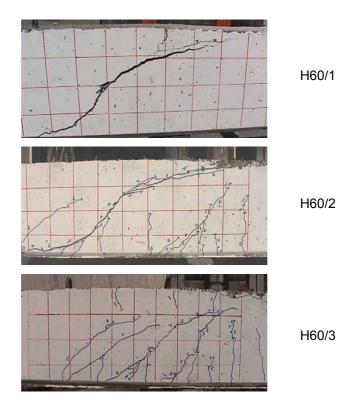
Influence of the amount of shear reinforcement. Failure shear stress of beams H60/1, H60/2, and H60/3.
